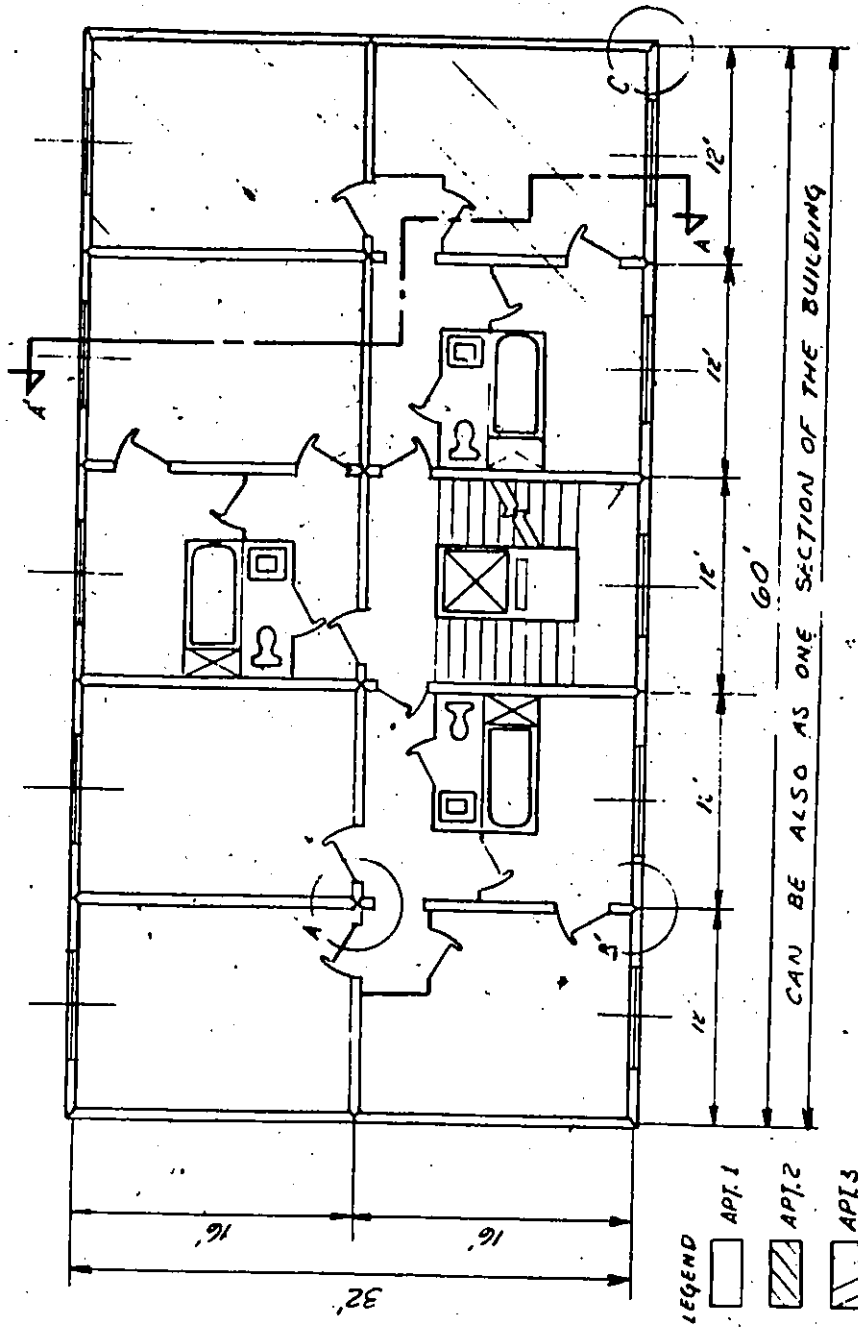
PLAN OF TYPICAL FLOOR OF PANELIZED DWELLING BUILDING
